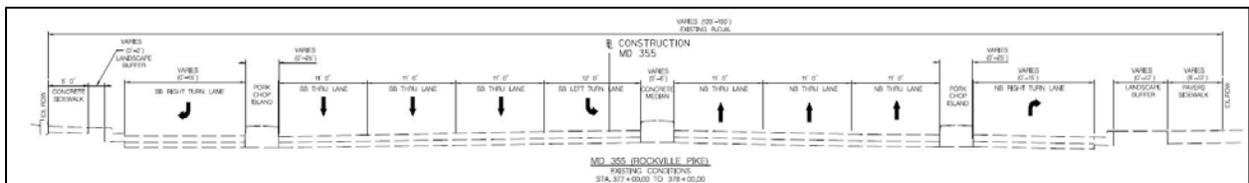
Existing Typical Cross Section – Rockville Pike North of Old Georgetown Road
